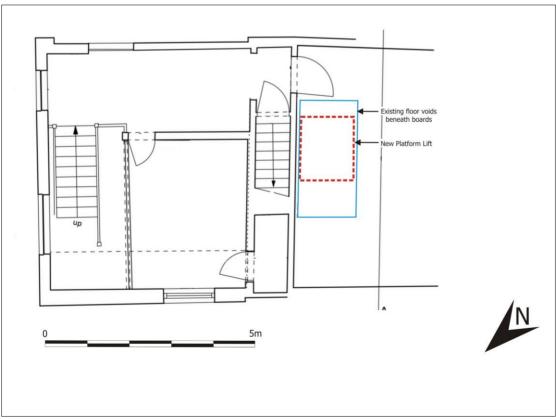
First Floor Plan with location of new lift in red and existing voids beneath floor in blue.
